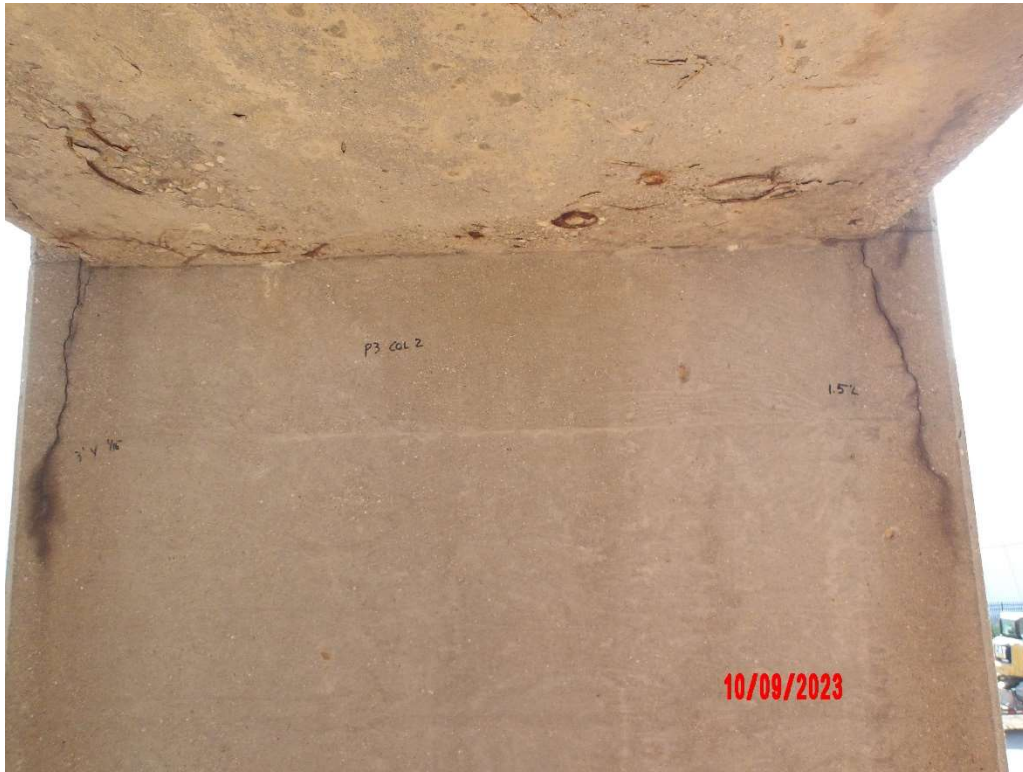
Pier 3, Column 2, Vertical Cracking 3'x1/16"W and 1 1/2' x 1/16"W
